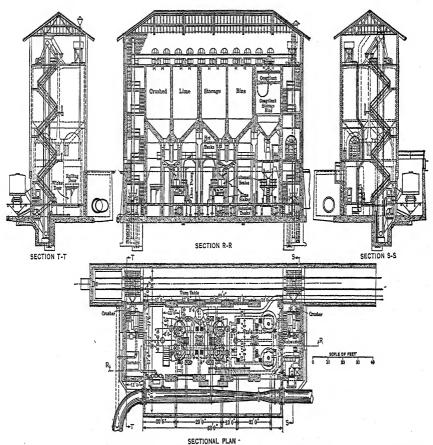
Plan of tanks and conveyor system used at Columbus, O., filter plant.
